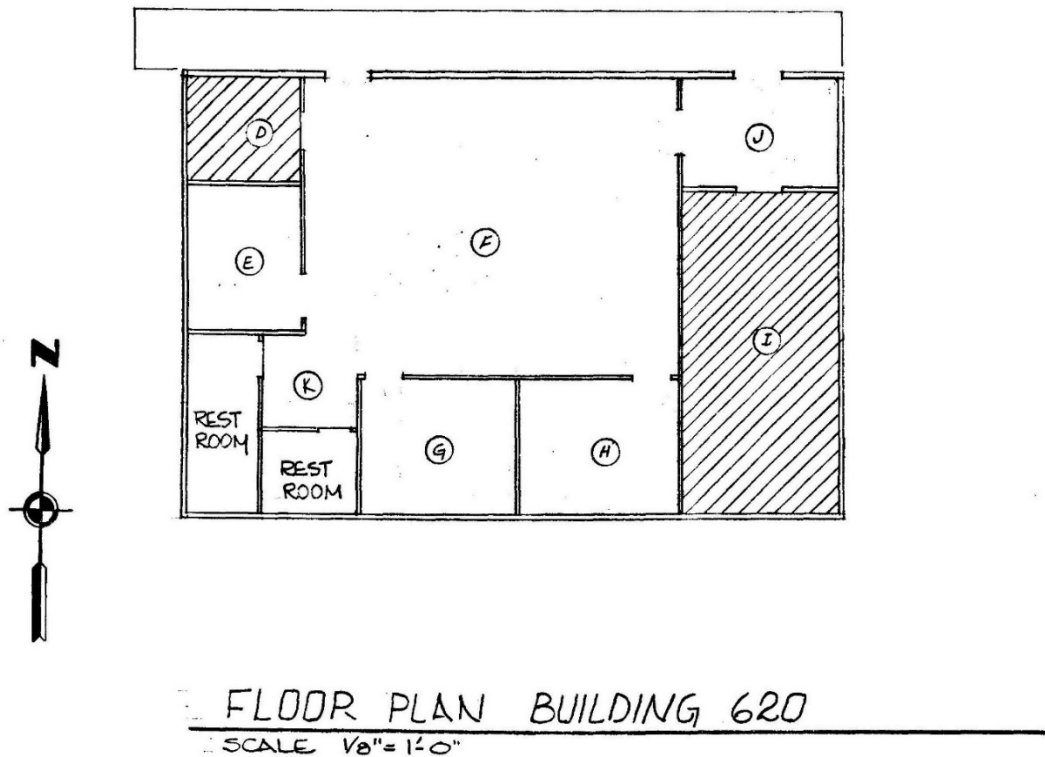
Plan drawing of carpet installation in Building 23-620, 1994 (REEC0 1994).
